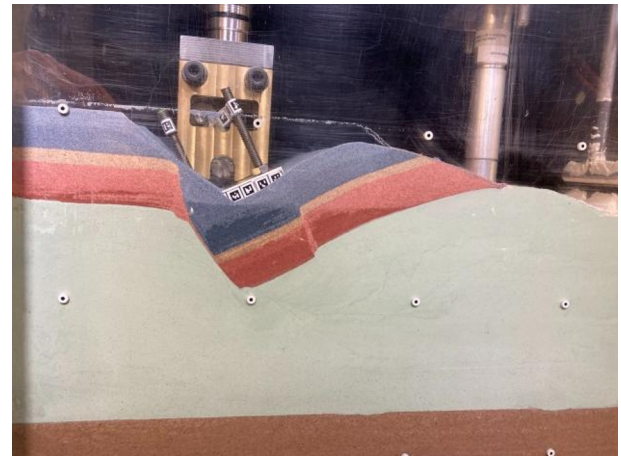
The sand embankment on top of a clay foundation, was brought to failure in the centrifuge.
